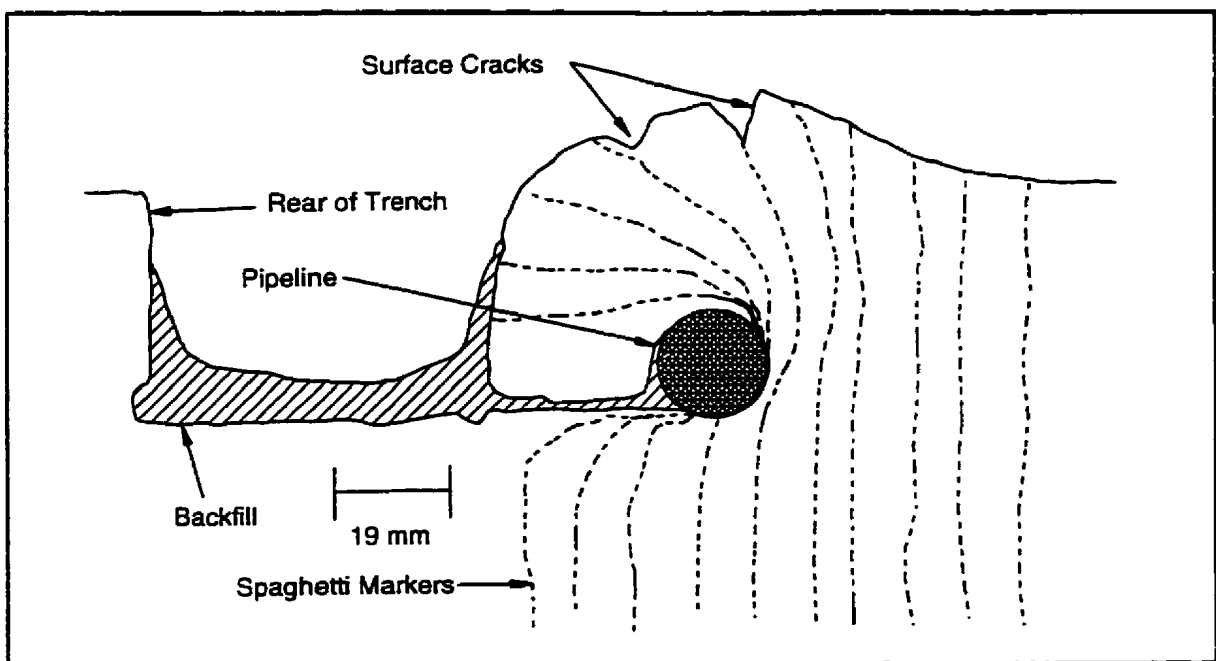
Sketch of excavated cross-section along mid length of model pipeline #2, 50mm wide trench, Test 03.
